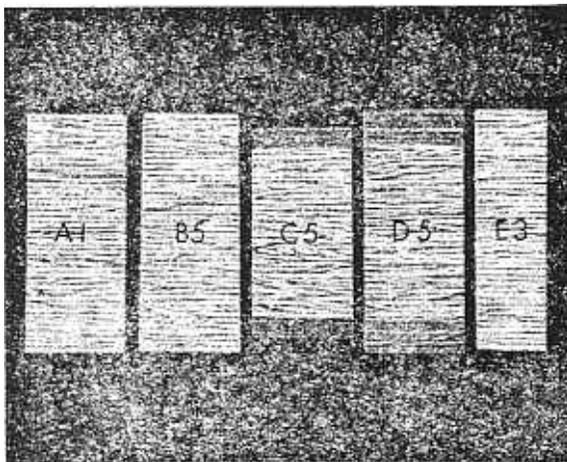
Typical cross sections of beams from each group: A — laminae randomly arranged; B — stiffest in outer laminae; C — stiffest in outer laminae with final six veneers on top and bottom densified with heat and pressure; D — stiffest in outer laminae with final six veneers on top and bottom impregnated with polymethylmethacrylate and irradiated; and E — narrow veneers, stiffest in outer laminae. Tension side at bottom on all beams.
